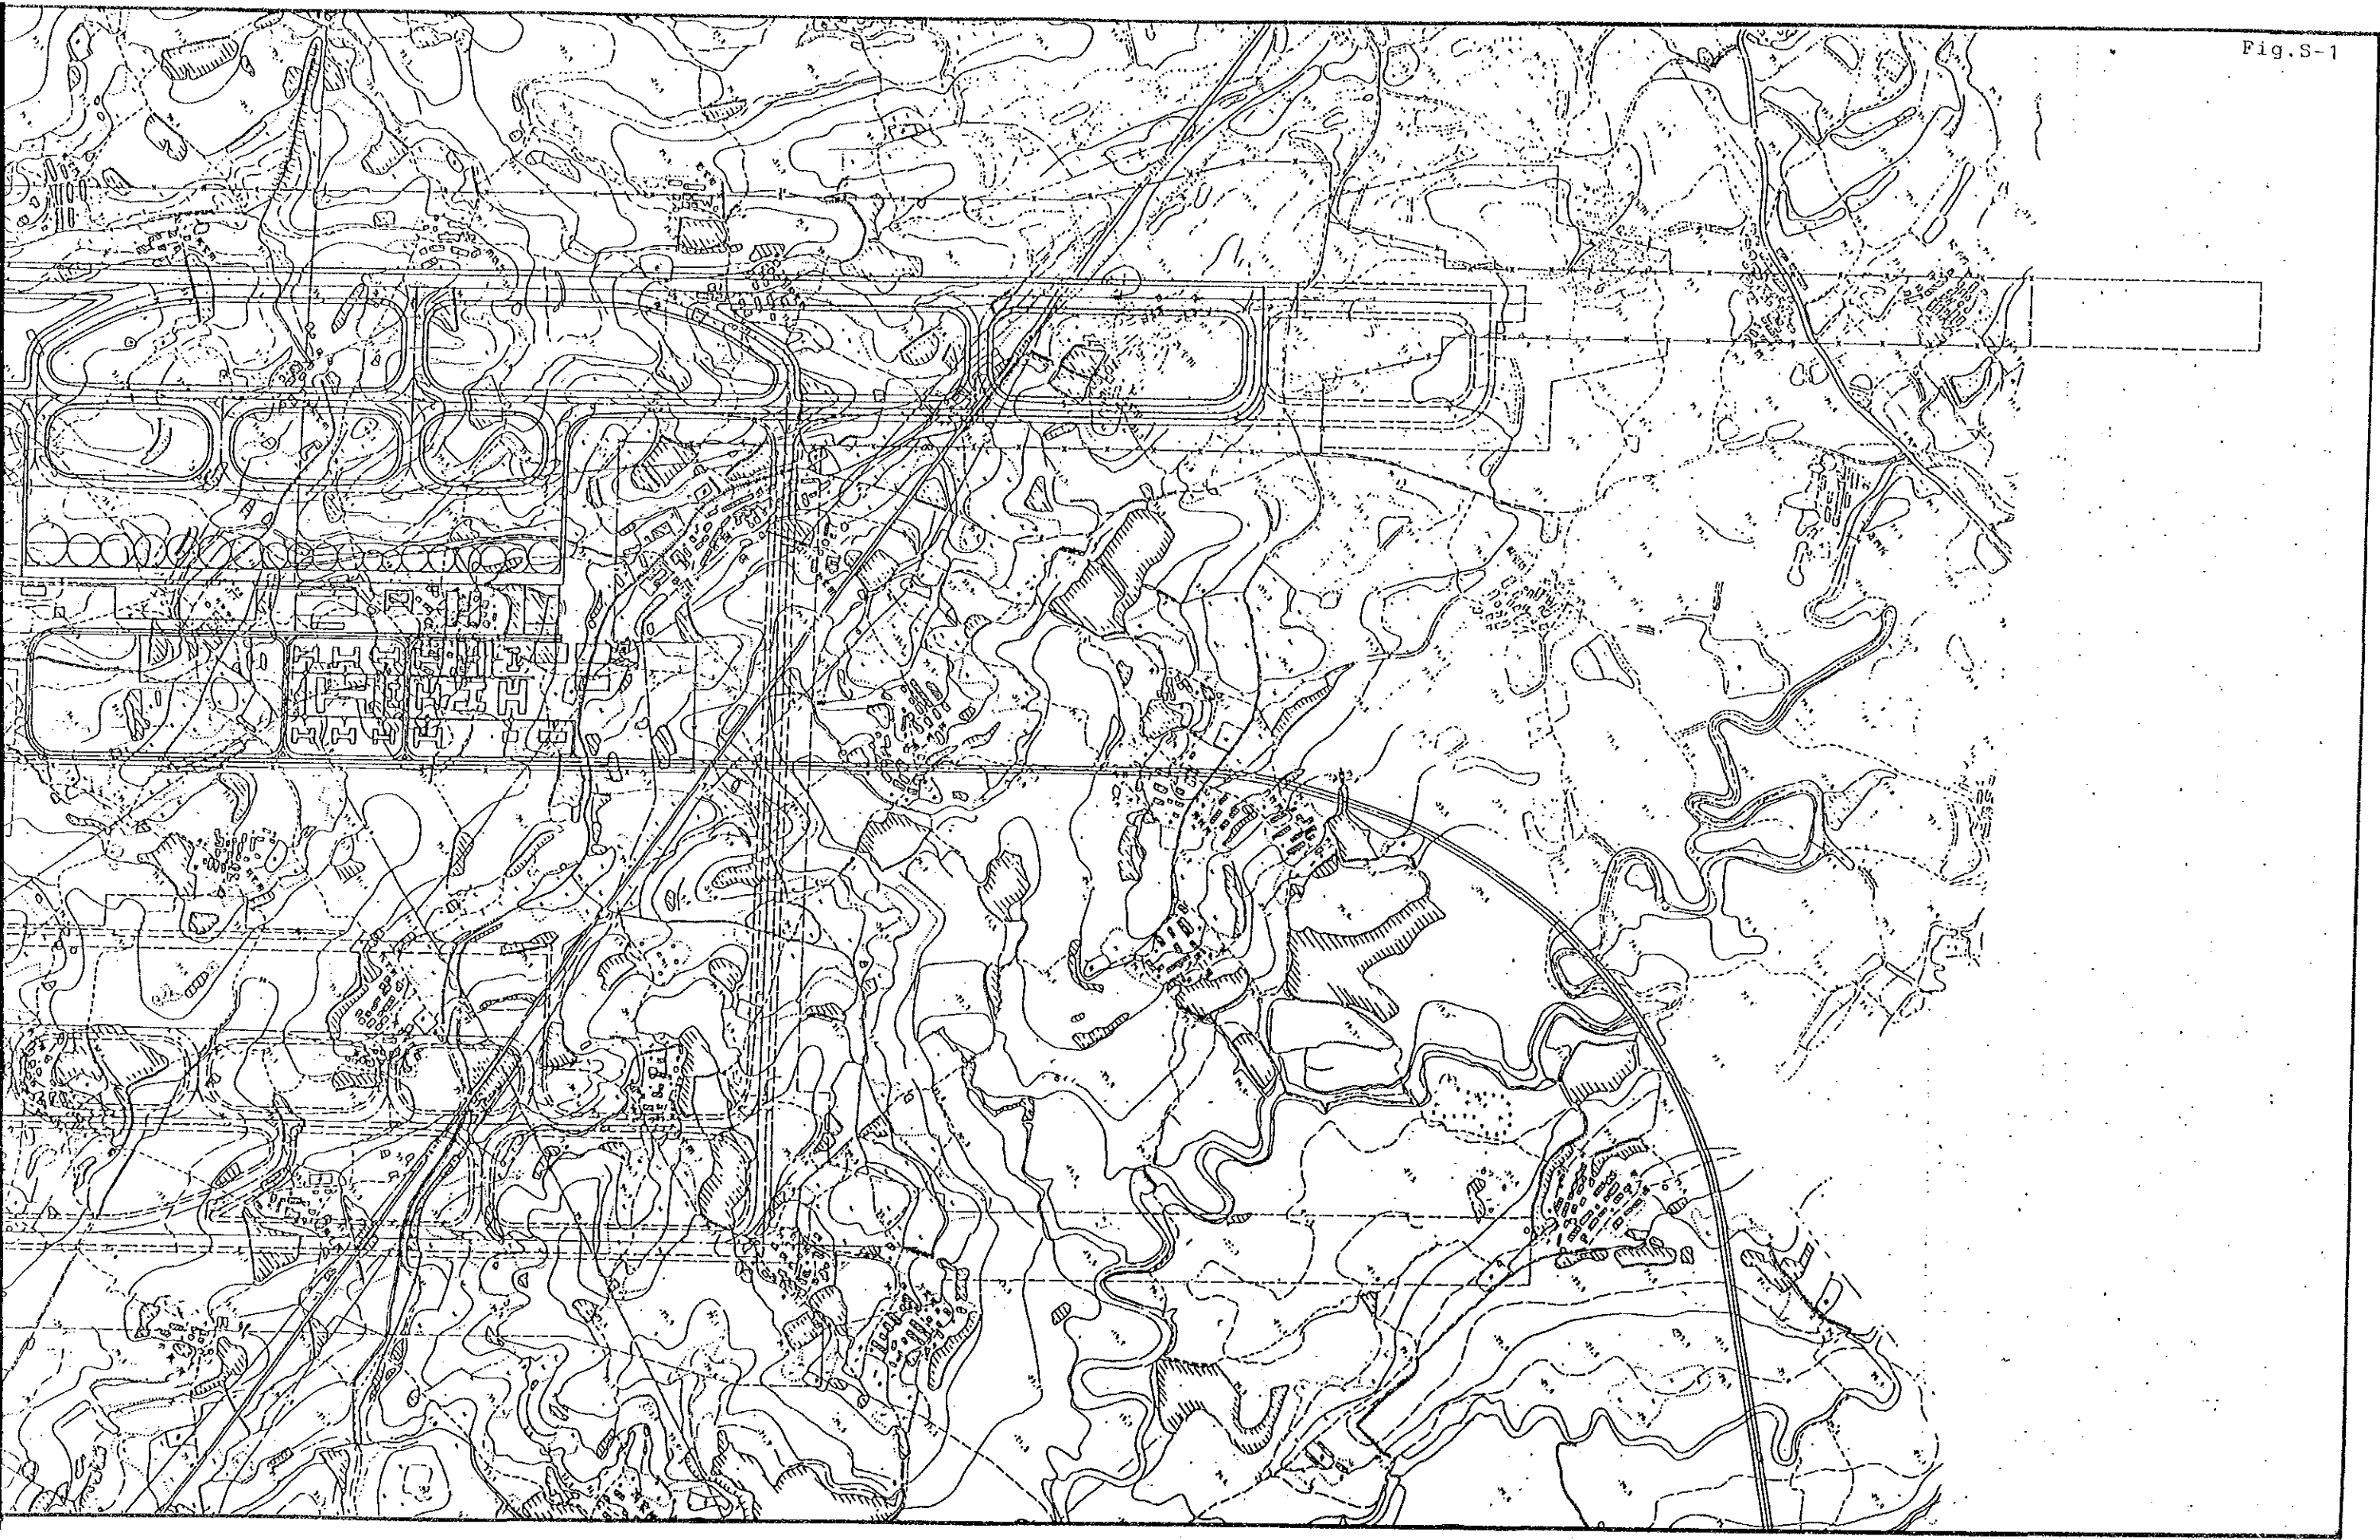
Overall Layout Plan of Airport Facilities - vii -
